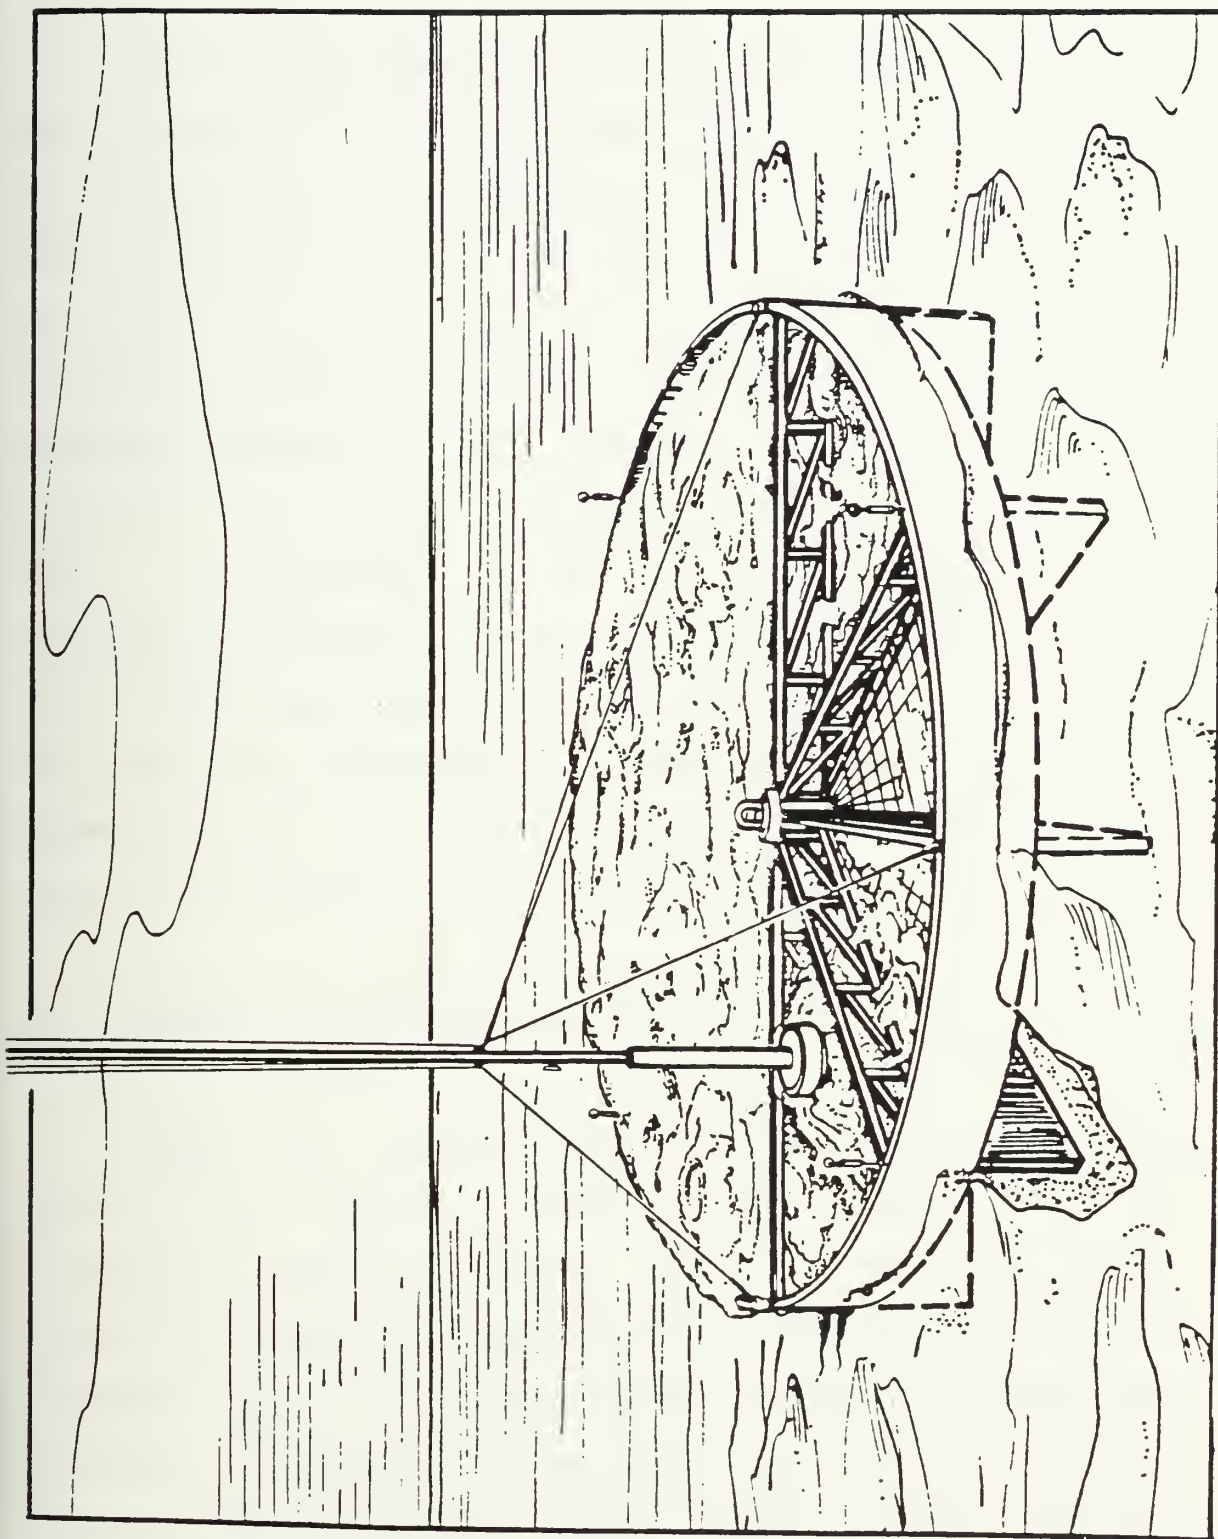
Concrete placement method used to fabricate multi-million pound capacity deadweight anchor. Source: (16:34)
